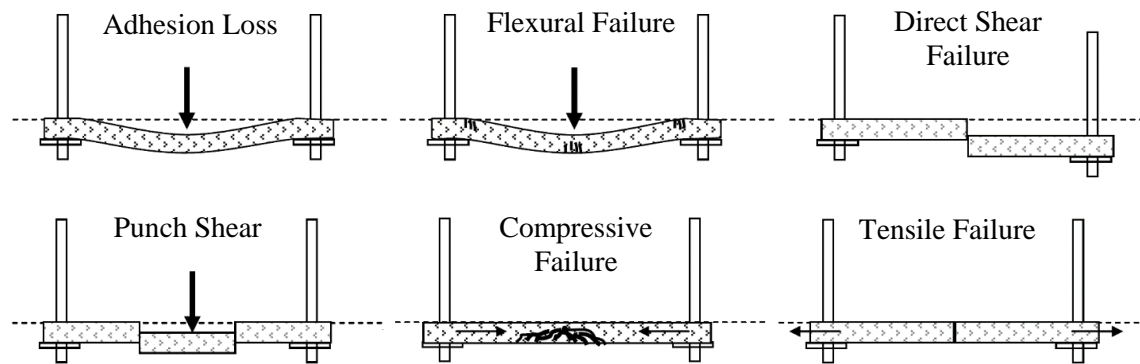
Shotcrete failure mechanisms (Morton, et al., 2009, modified after Barrett & McCreath, 1995).
